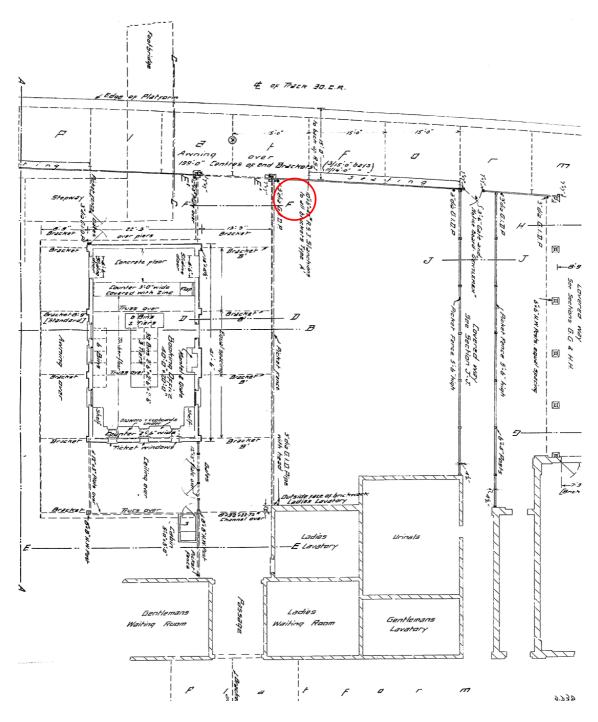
Ground Plan, taken from NSWR Moss Vale Booking Office Platform Awnings and Covered Ways drawing, dated 1915. The plan shows the extent of the courtyard garden area with covered ways to the north and south, WC buildings to the west and Platform 2 and covered awning to the east. The approximate location of the proposed pothole and borehole is indicated in red. (Source: Sydney Trains Virtual Plan Room)
